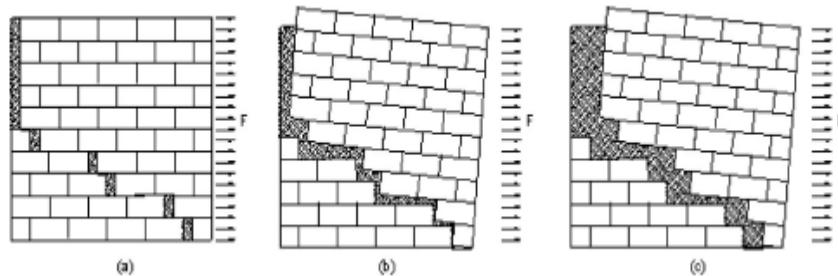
The undeformed shape and expected failure mechanism of a load bearing wallof a Portuguese Castle [29].
